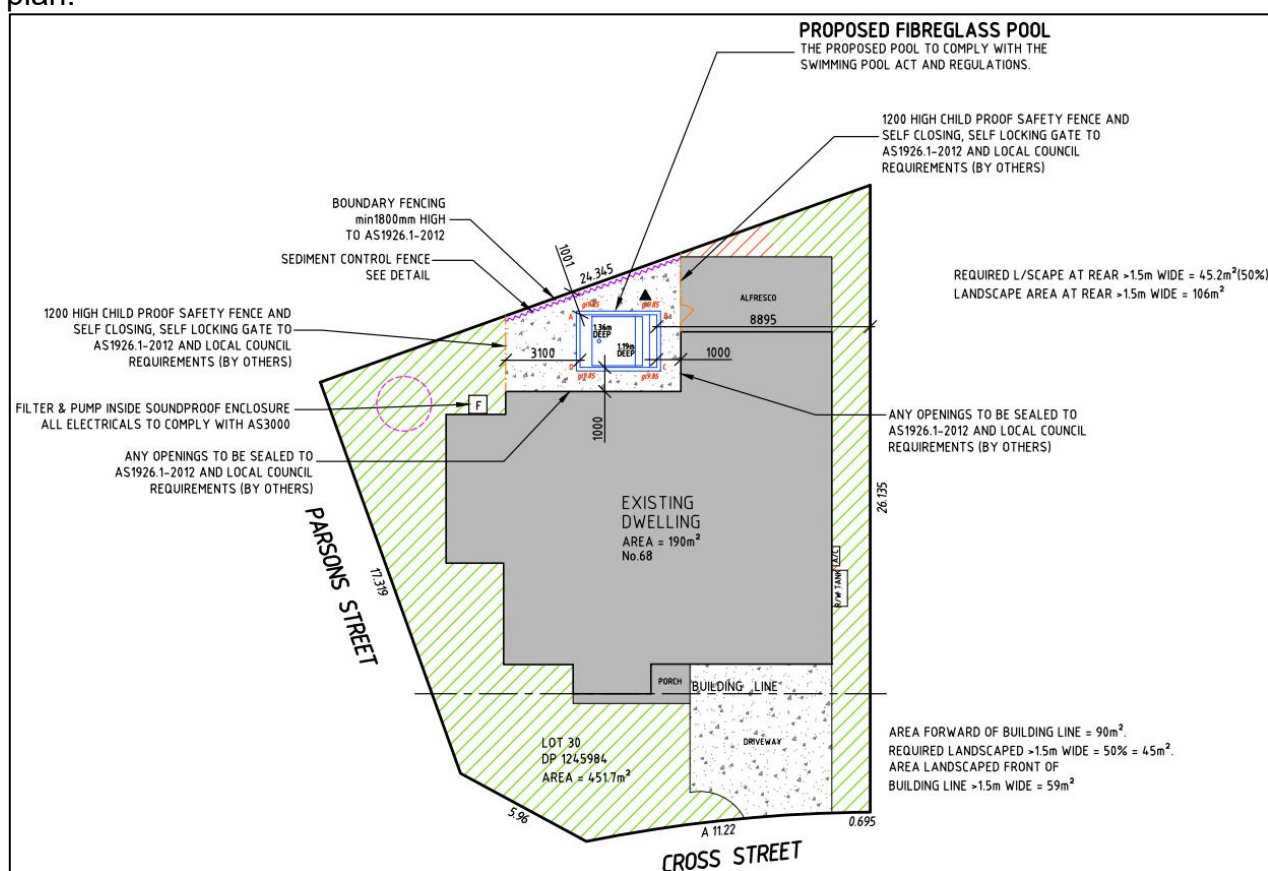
Excerpt of proposed Site Plan. Pool is shown in blue, pool fences are shown in orange and surrounding pool concrete/paved area shown in white and grey. Source: Bombora Pools.
